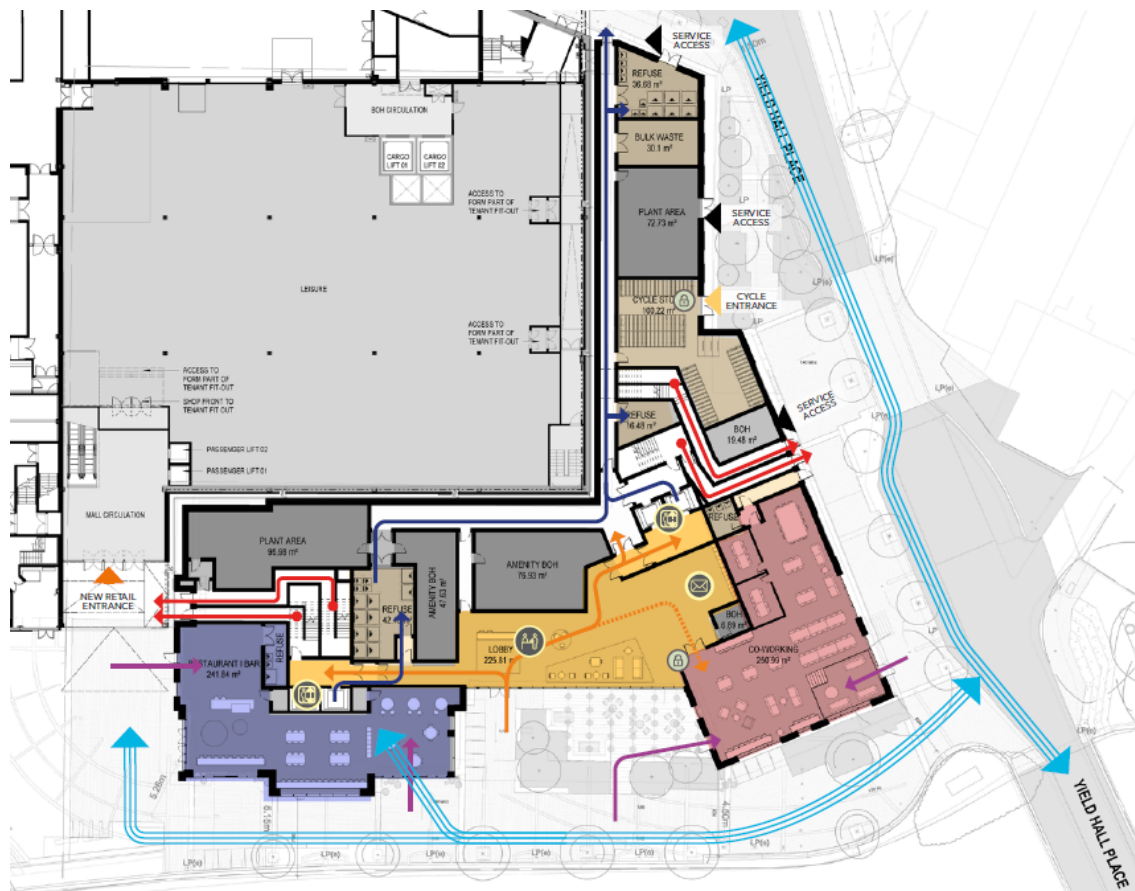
YHP1 – Proposed ground floor plan showing access to the building
